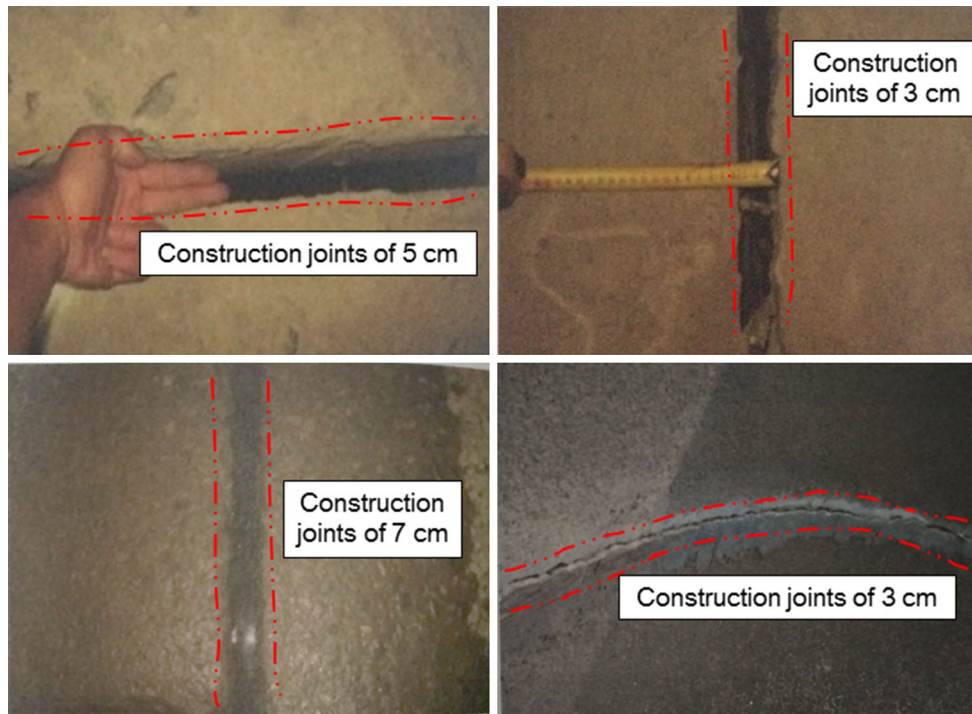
The construction joints cracking (Chen et al. 2010)
